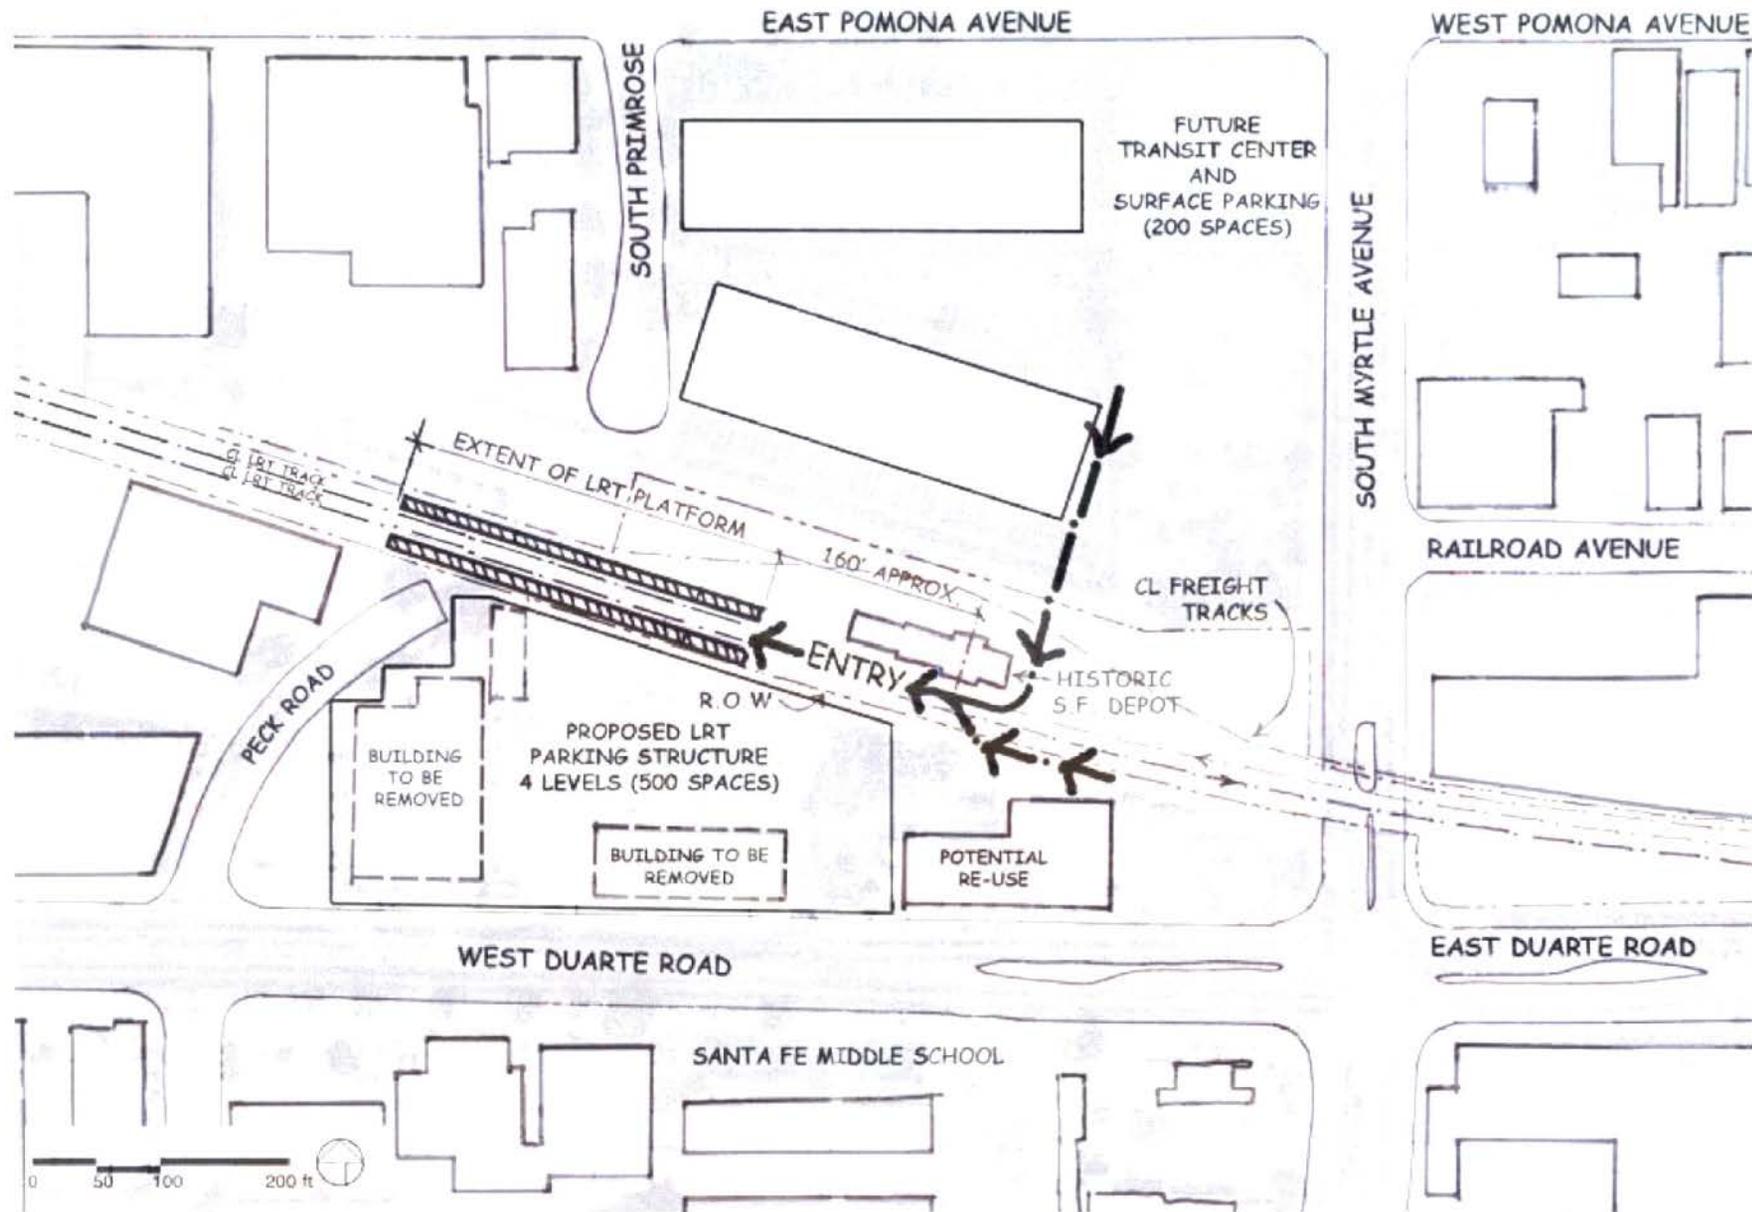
Site Plan: City of Monrovia Station, 2-Track Alternative
